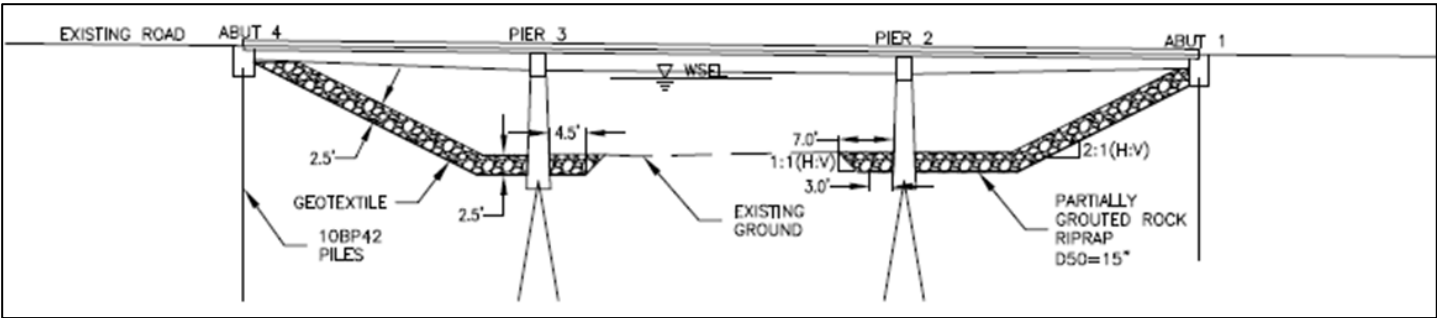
Cross-sectional view of Bridge G-25-F with recommended hydraulic scour countermeasures
